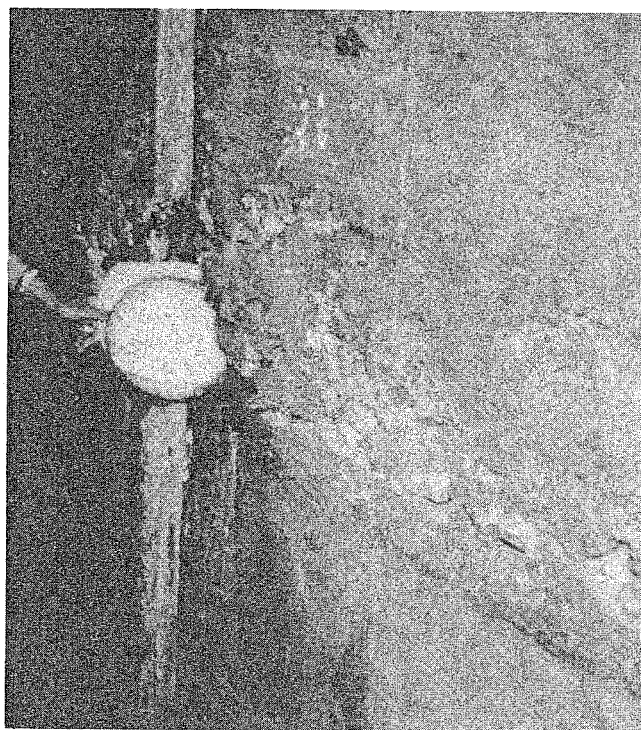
Poorly consolidated concrete adjacent to face drain, July 1980, Richard B. Russell Dam
